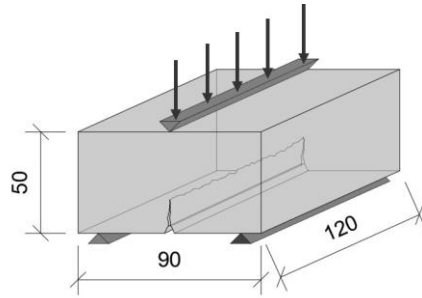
Specimen geometry and cracking procedure (dimension in mm).
